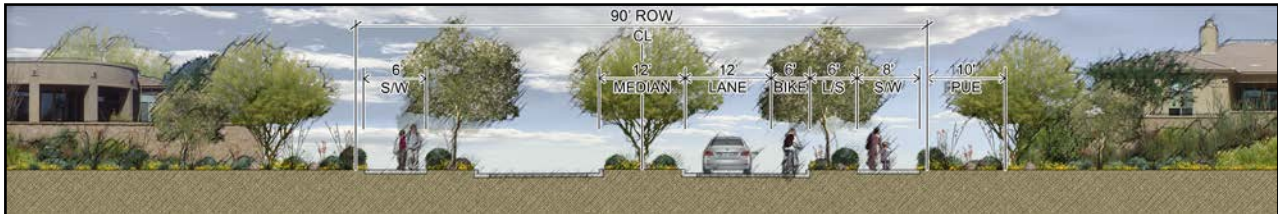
Standard 2-Lane Collector Street with Center Median Cross-Section
